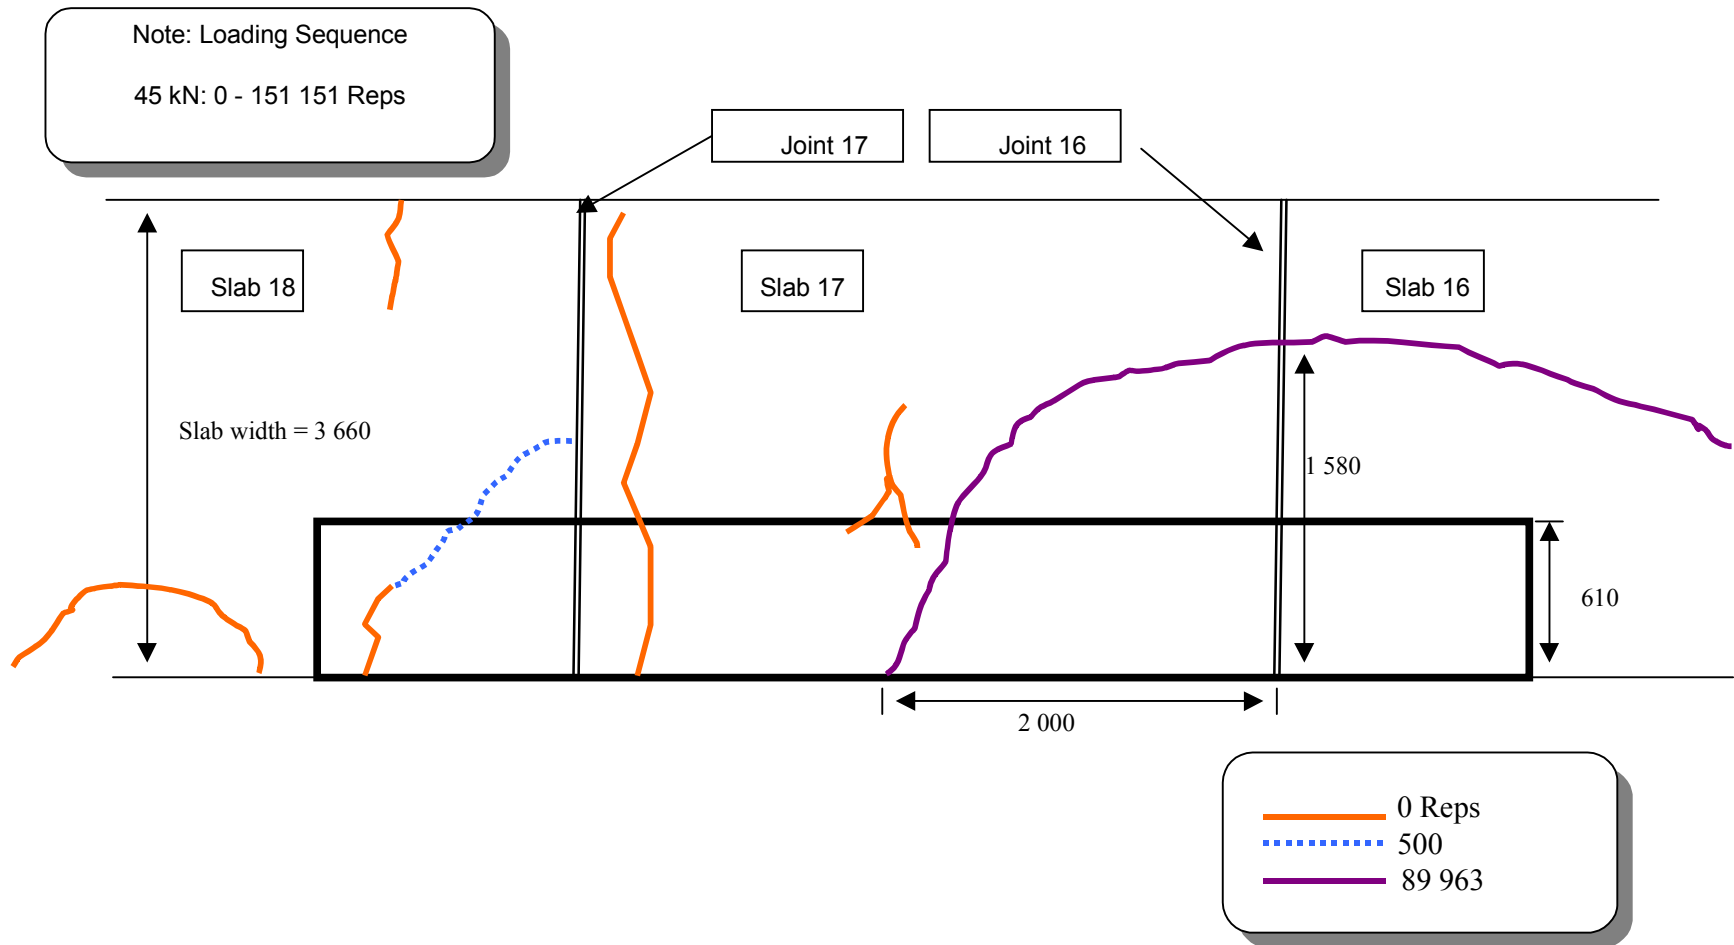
Schematic of crack development, Test Section 523FD (not to scale).
